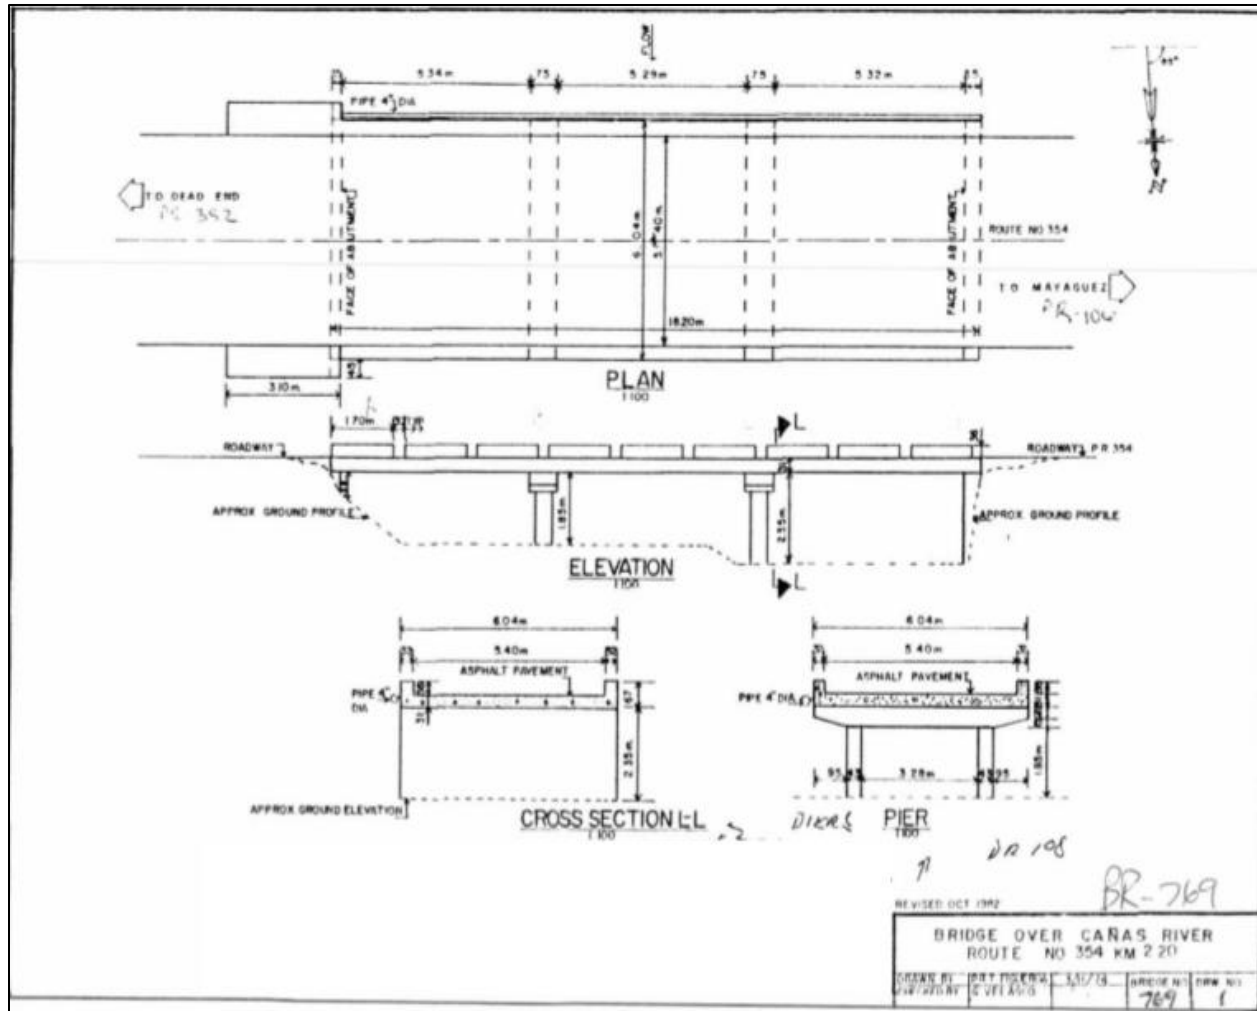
Bridge 769 drawings (source: PRHTA)
